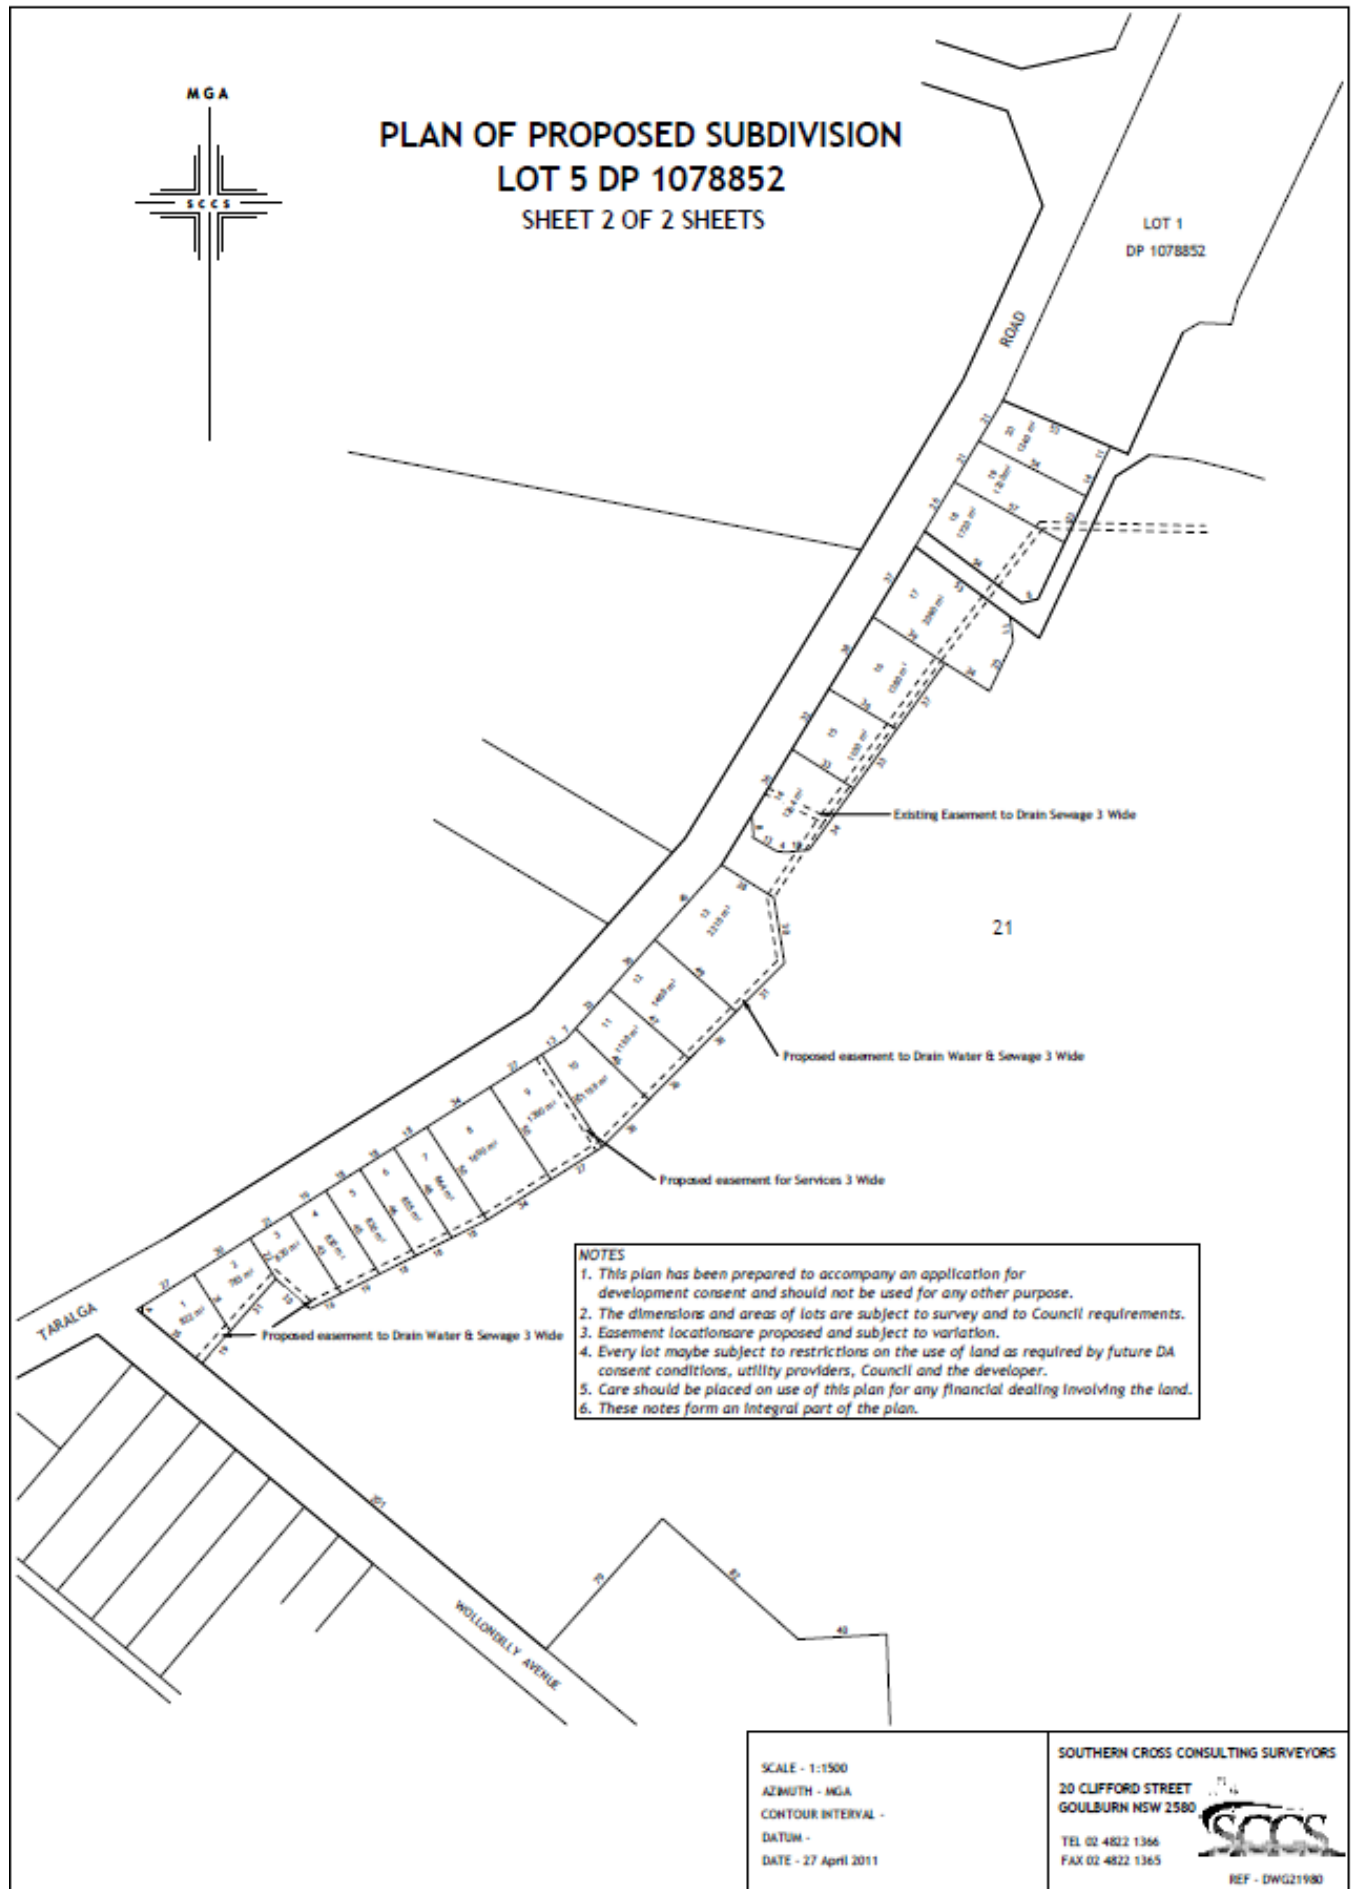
Proposed Subdivision Site Plan (Lots 1 – 20)
